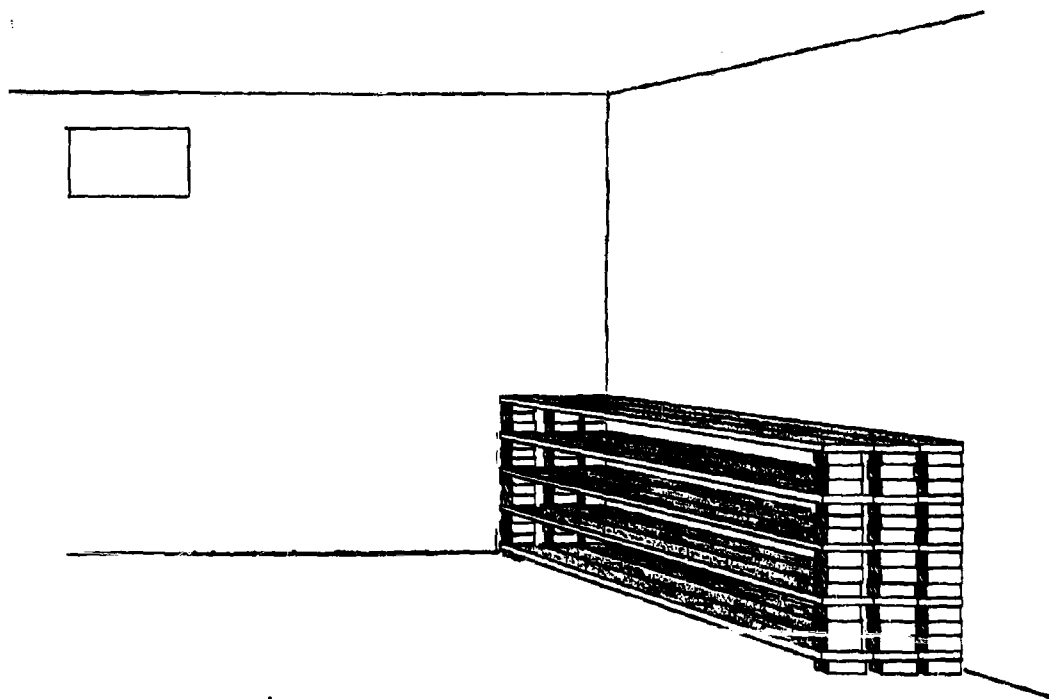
Storing Shelter Planks in the Form of Temporary Shelving
